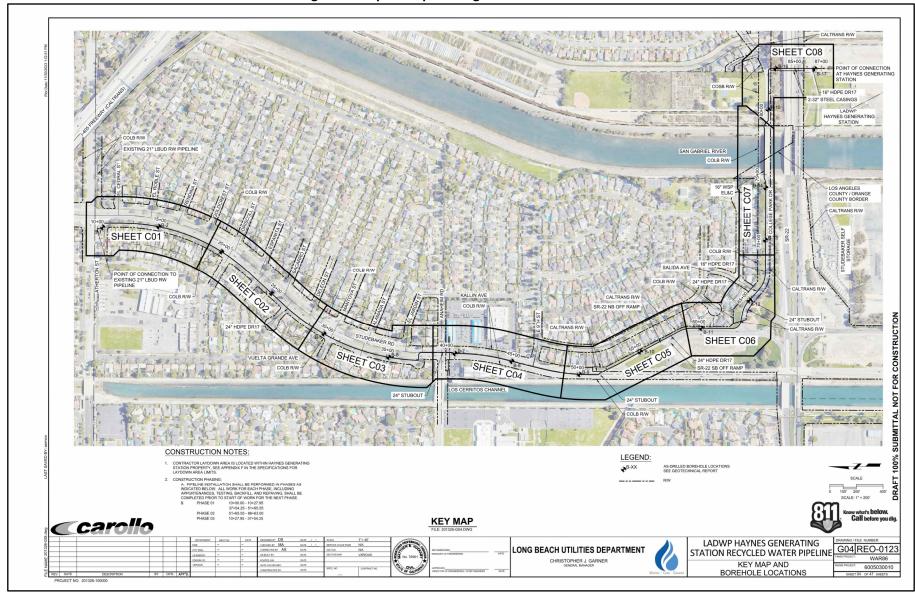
Proposed Pipeline Alignment – Index Sheet
